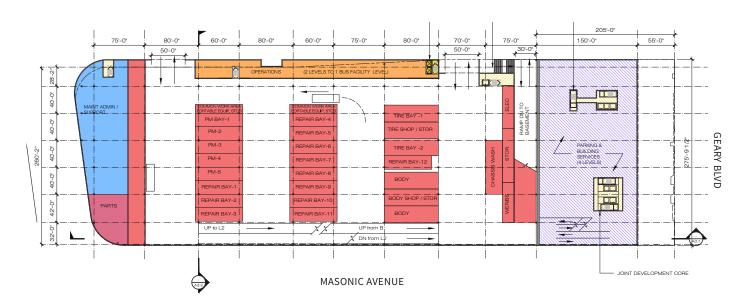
BUS FACILITY CONCEPT DESIGN - GROUND LEVEL PLAN
